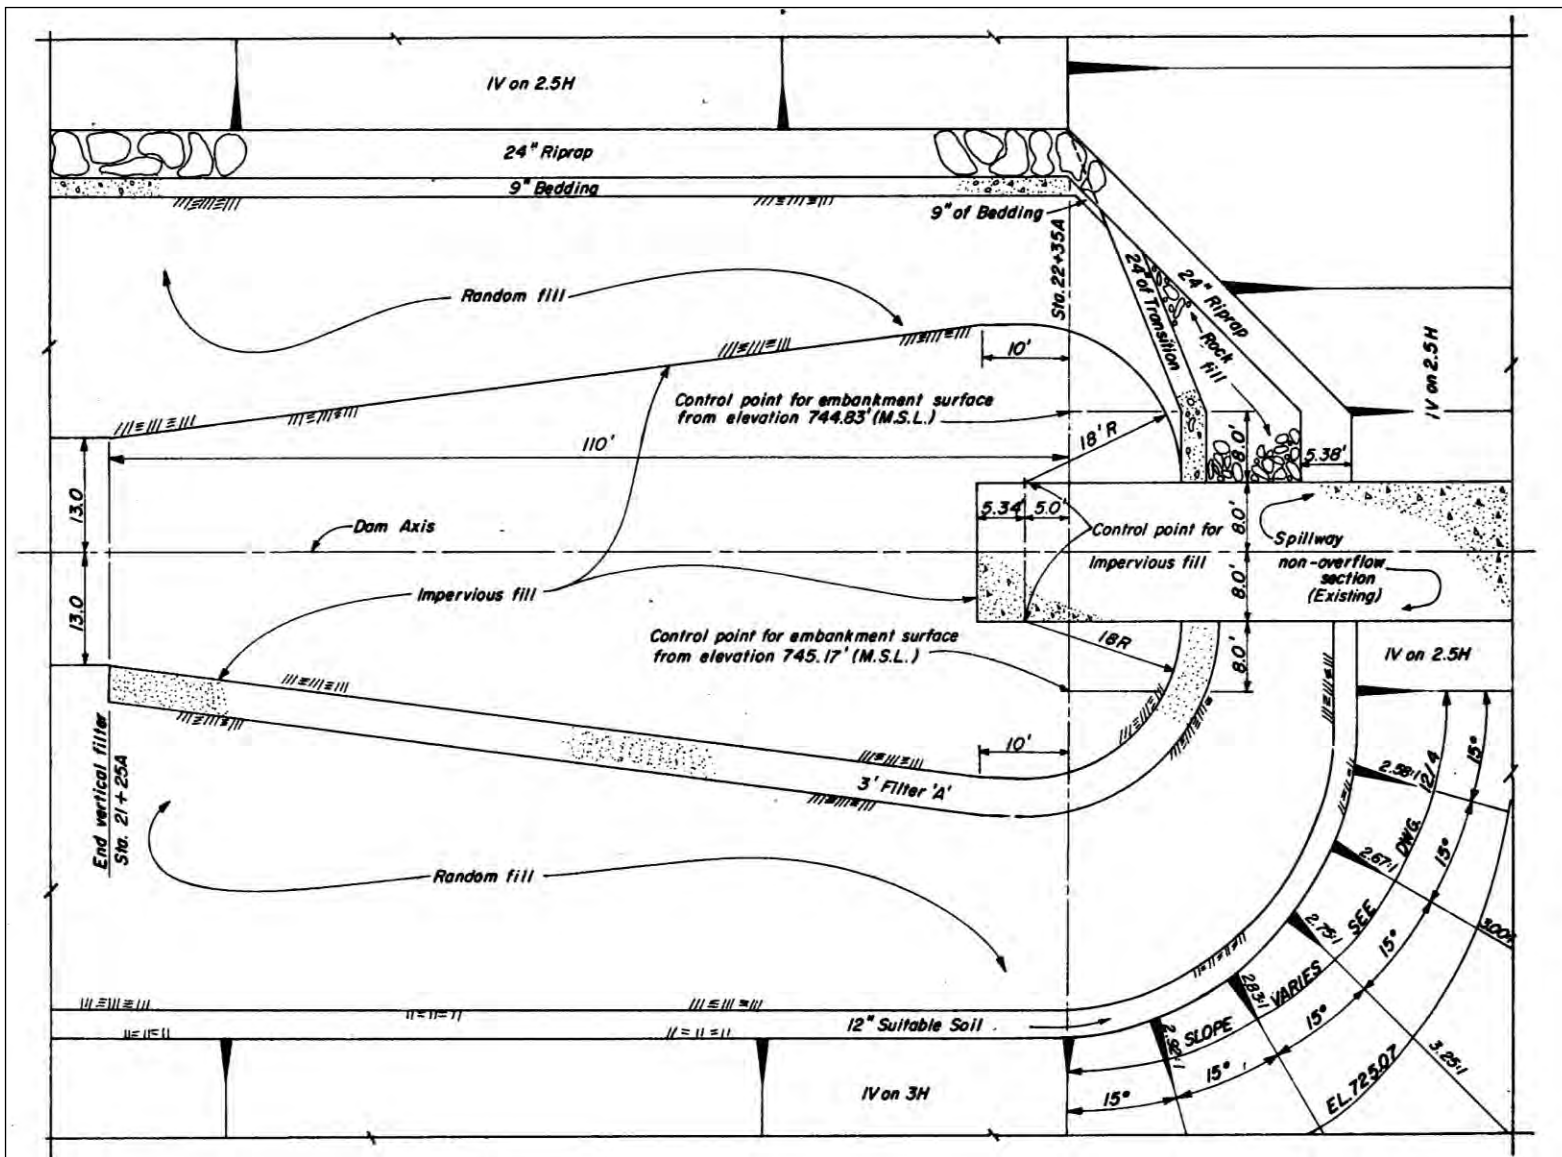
Filter protection used in the embankment section as it abuts the concrete section of a composite dam.
